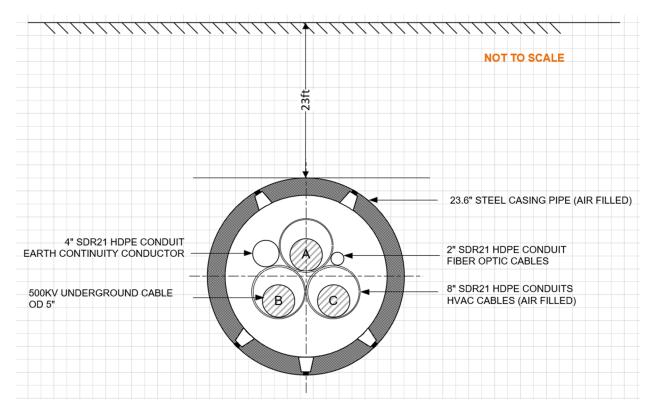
Conceptual Design for HV Underground Cable Highway Crossing
